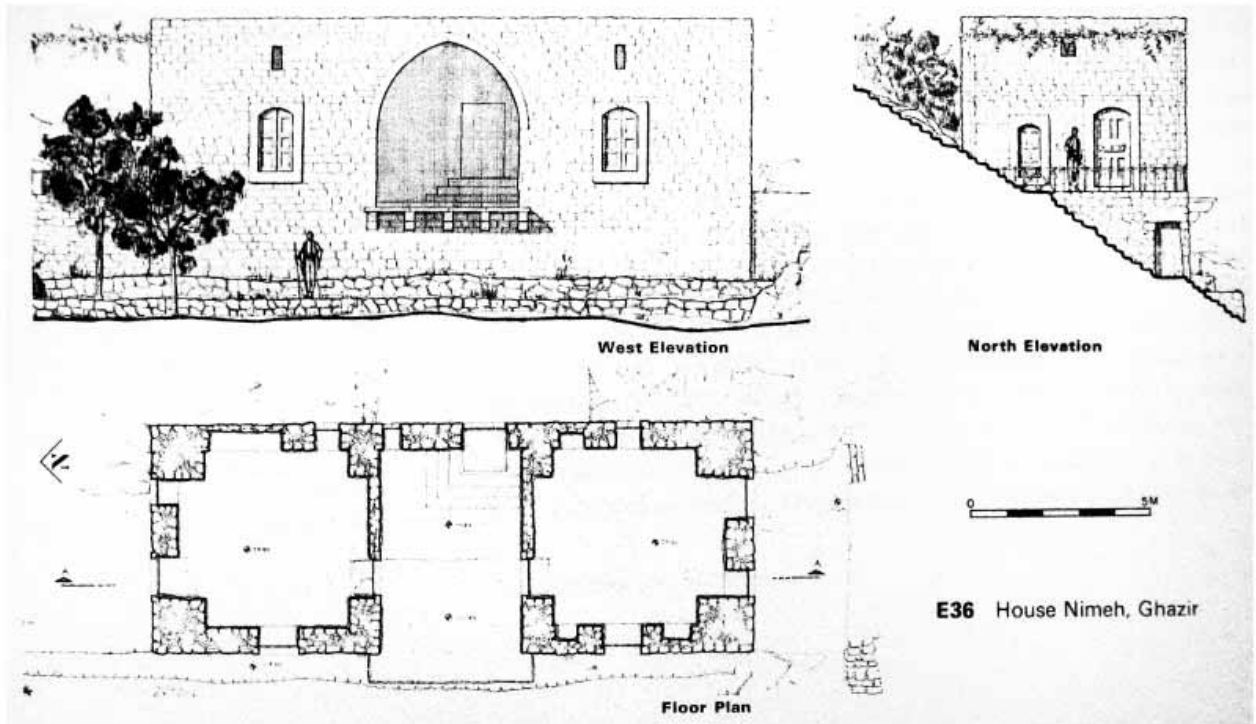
(Above): Plan and elevations showing typical *liwan* houses in Lebanon.
